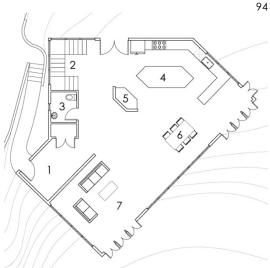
First Floor Plan - 1. Entry 2. Stairs 3. Powder Room 4. Kitchen 5. Pantry 6. Dining 7. Living
